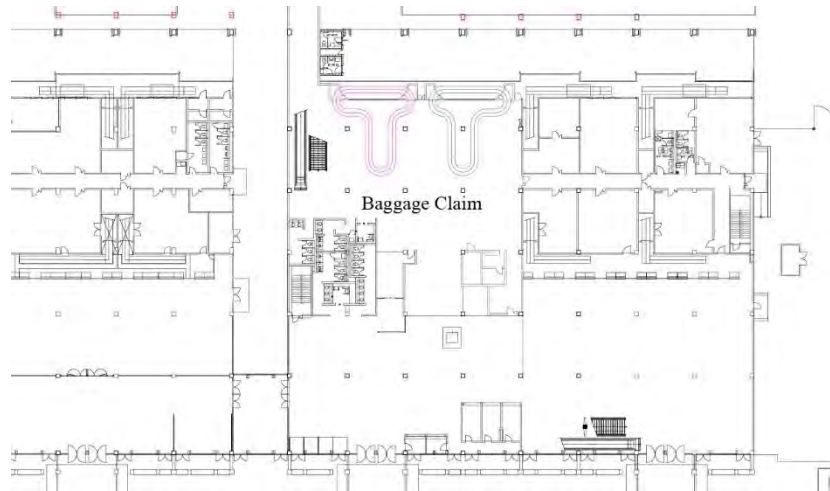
Additional Baggage Claim Belt in Domestic Passenger Terminal Building
